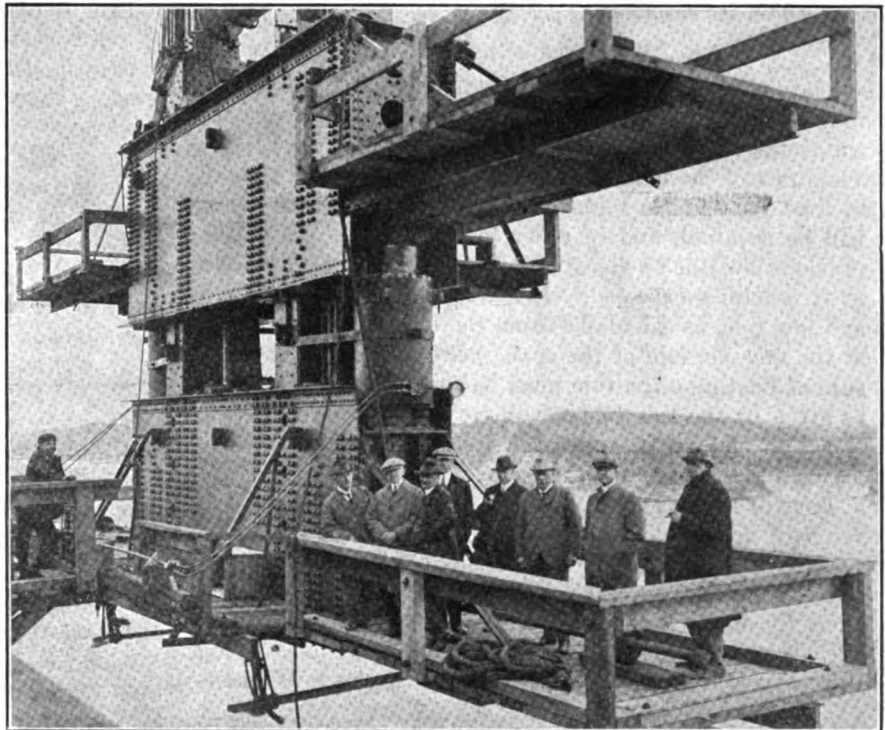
UPPER AND LOWER JACKING GIRDERS FOR HOISTING QUEBEC SUSPENDED SPAN
